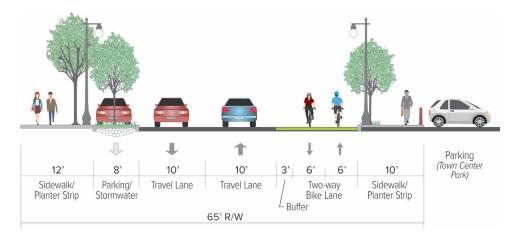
TOWN CENTER PLAN CROSS-SECTIONS (CONT.)
